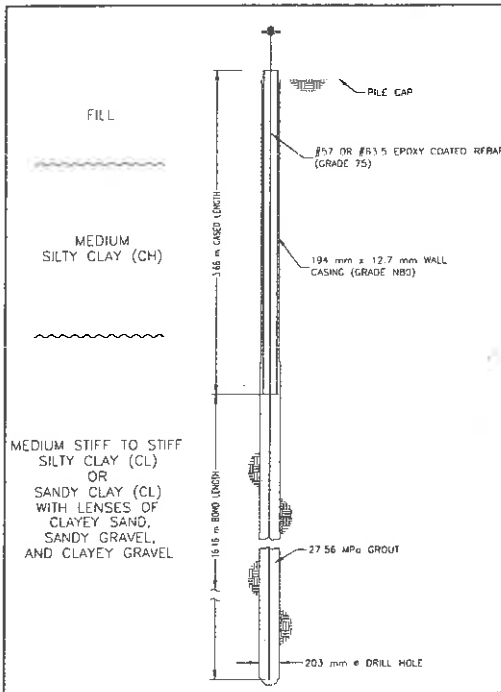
Soil Profile and Mini-Pile Details for an Industrial Building in Emeryville, California
